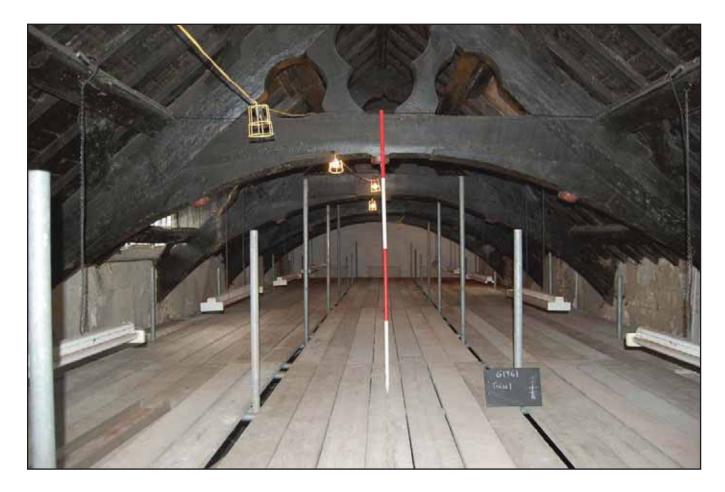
Old Grammar School internal- view south of roof trusses during renovation works. Scale: 2.0m
